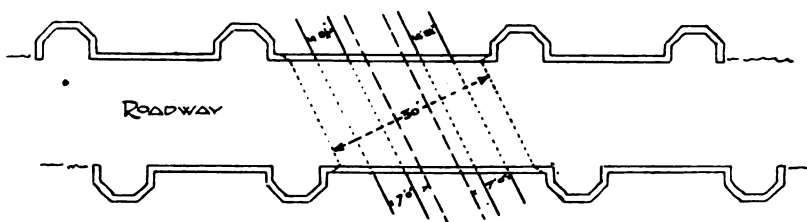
PLAN OF SKEWBRIDGE AT KEYNSHAM, G.W. RAILWAY.
